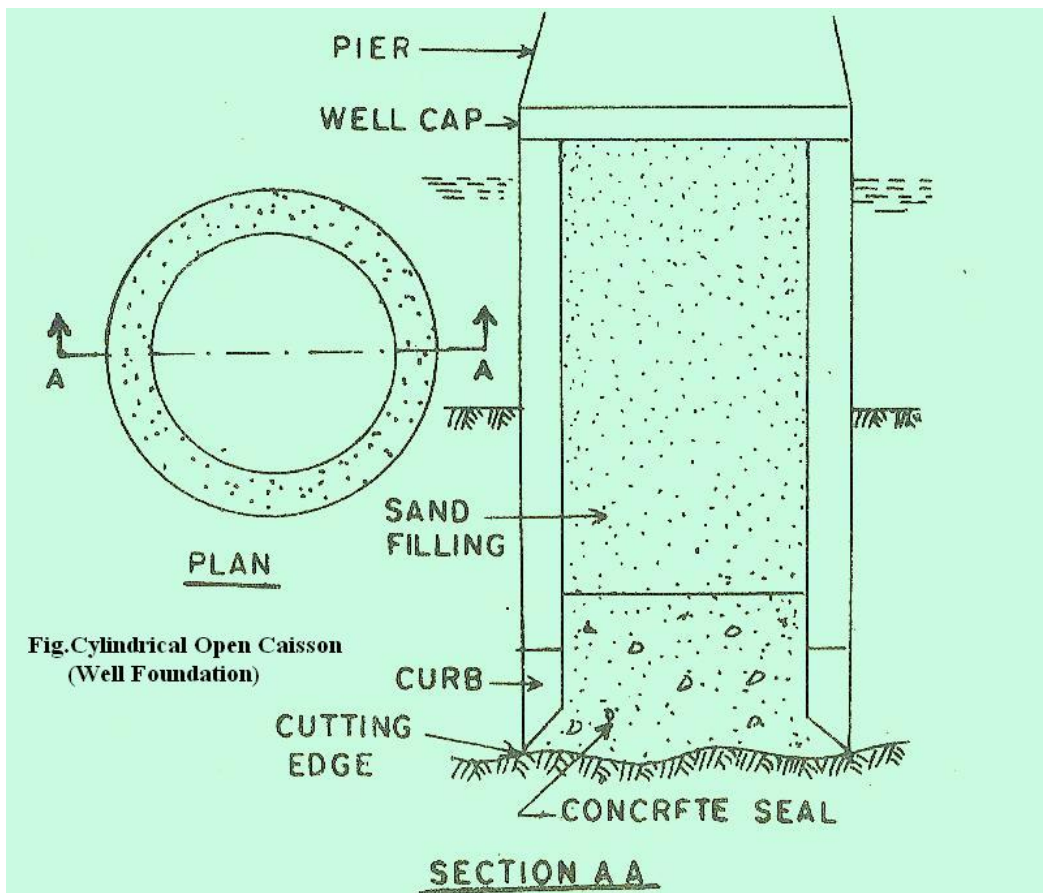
Diagram of an open caisson after it has been converted to a bridge foundation. Source: [15].
